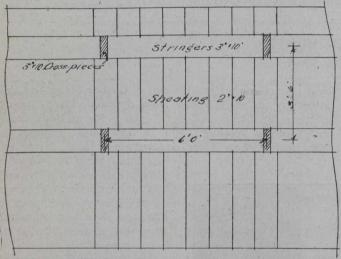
Longitudinal Section Showing Method of Shoring Trench.
